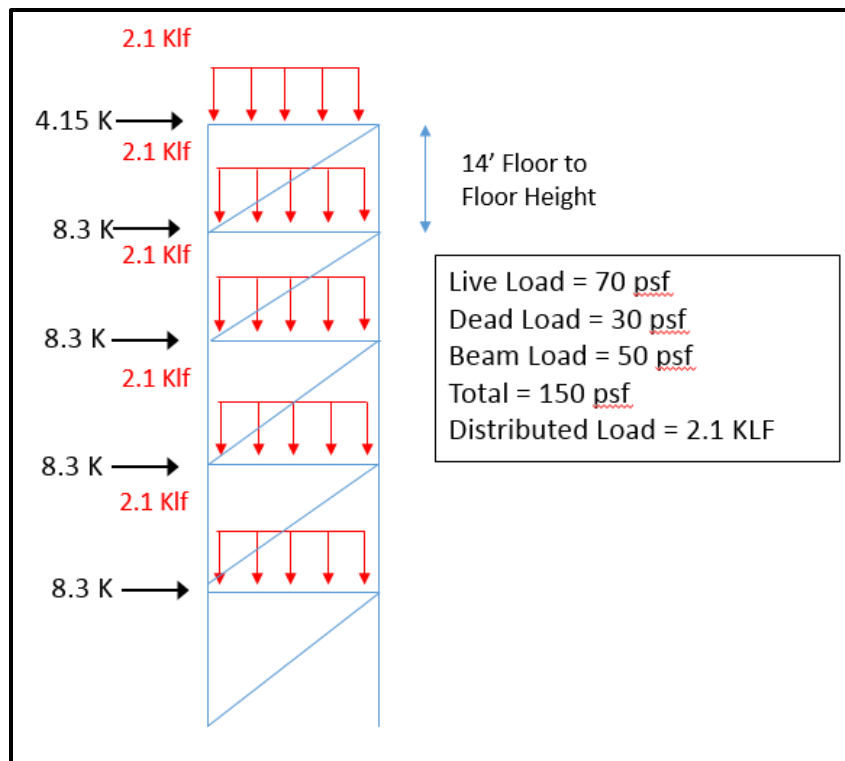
Load Calculations for 14' Wide Area of Stair Tower
